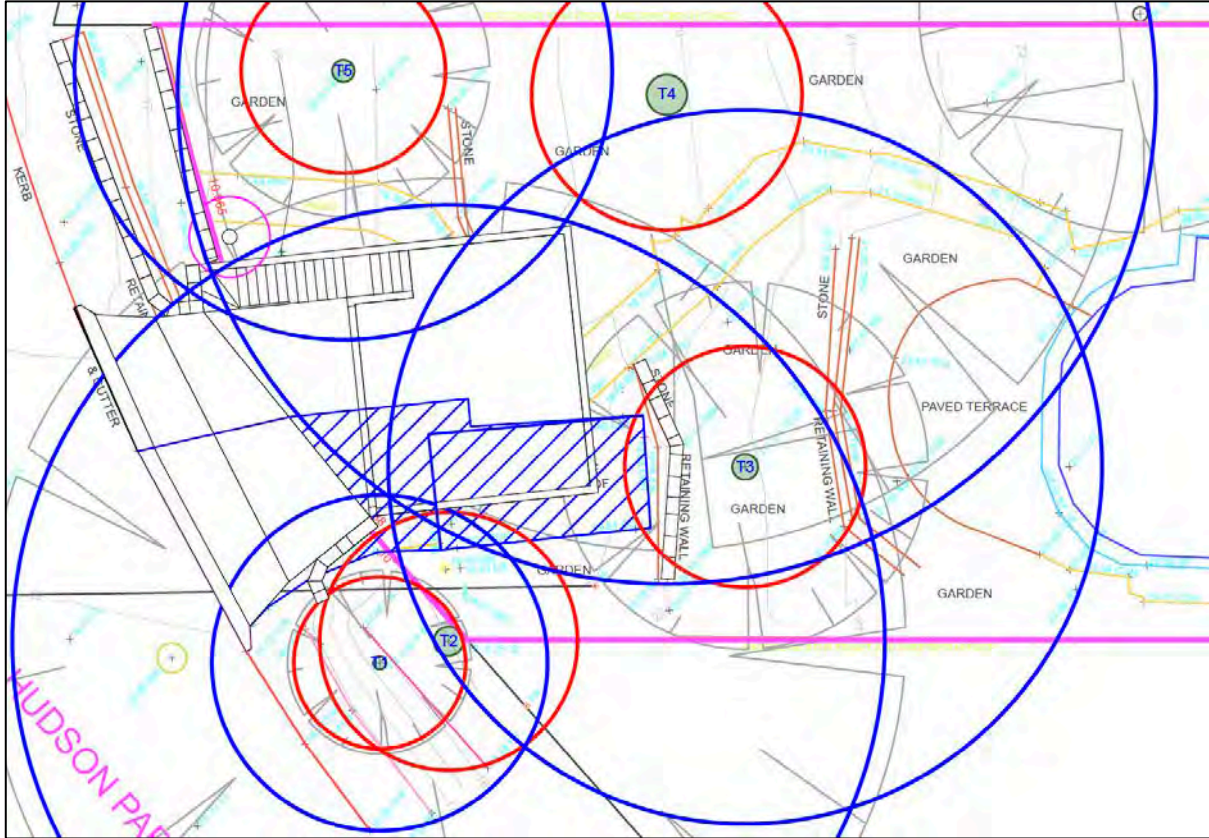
The plan depicting the existing garage and proposed double garage with SRZ's and NRZ's overlaid. (Source: Site Plans by askerroberston design and construction dated 18/06/2025)
